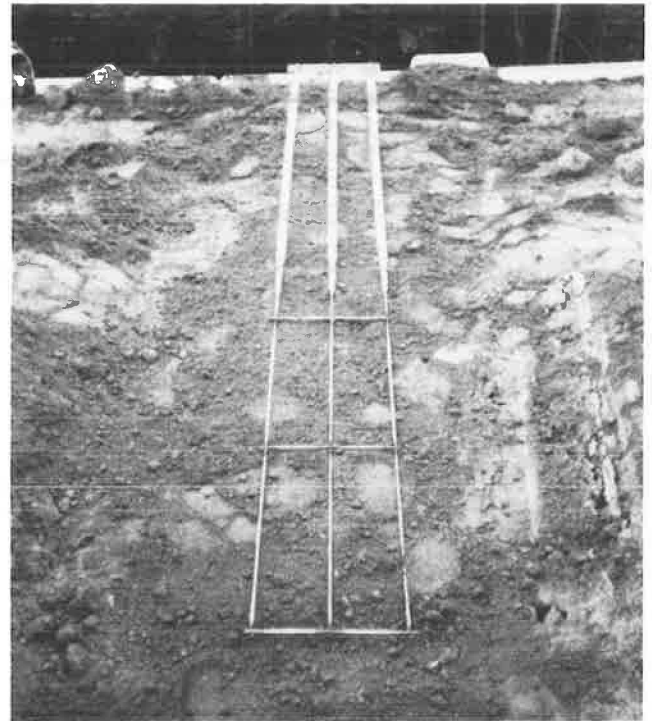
Typical dummy bar-mat (three transverse bars) placed in backfill during construction.
